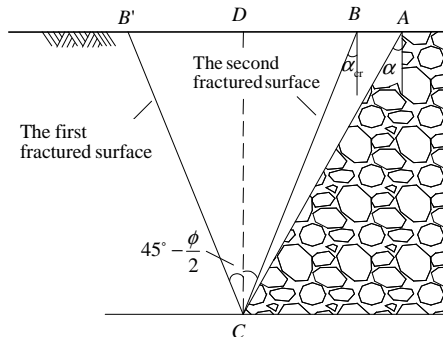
Position of Fractured Surface of Planar Retaining Wall
